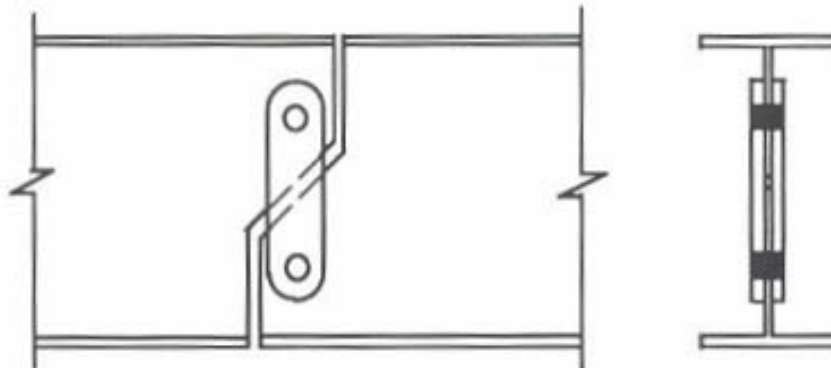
Pin and hanger schematic, elevation and cross section [2]
